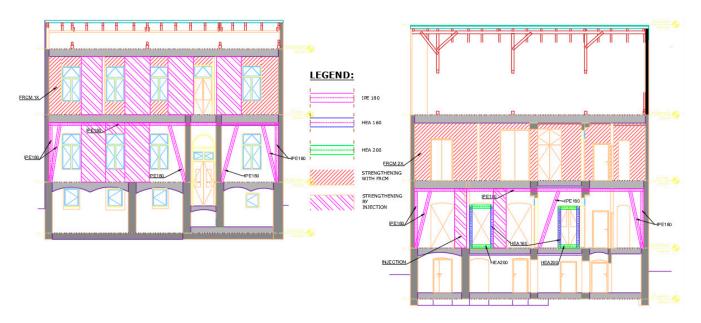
Cross-sections 1-1 and 2-2, Strengthening measures.
